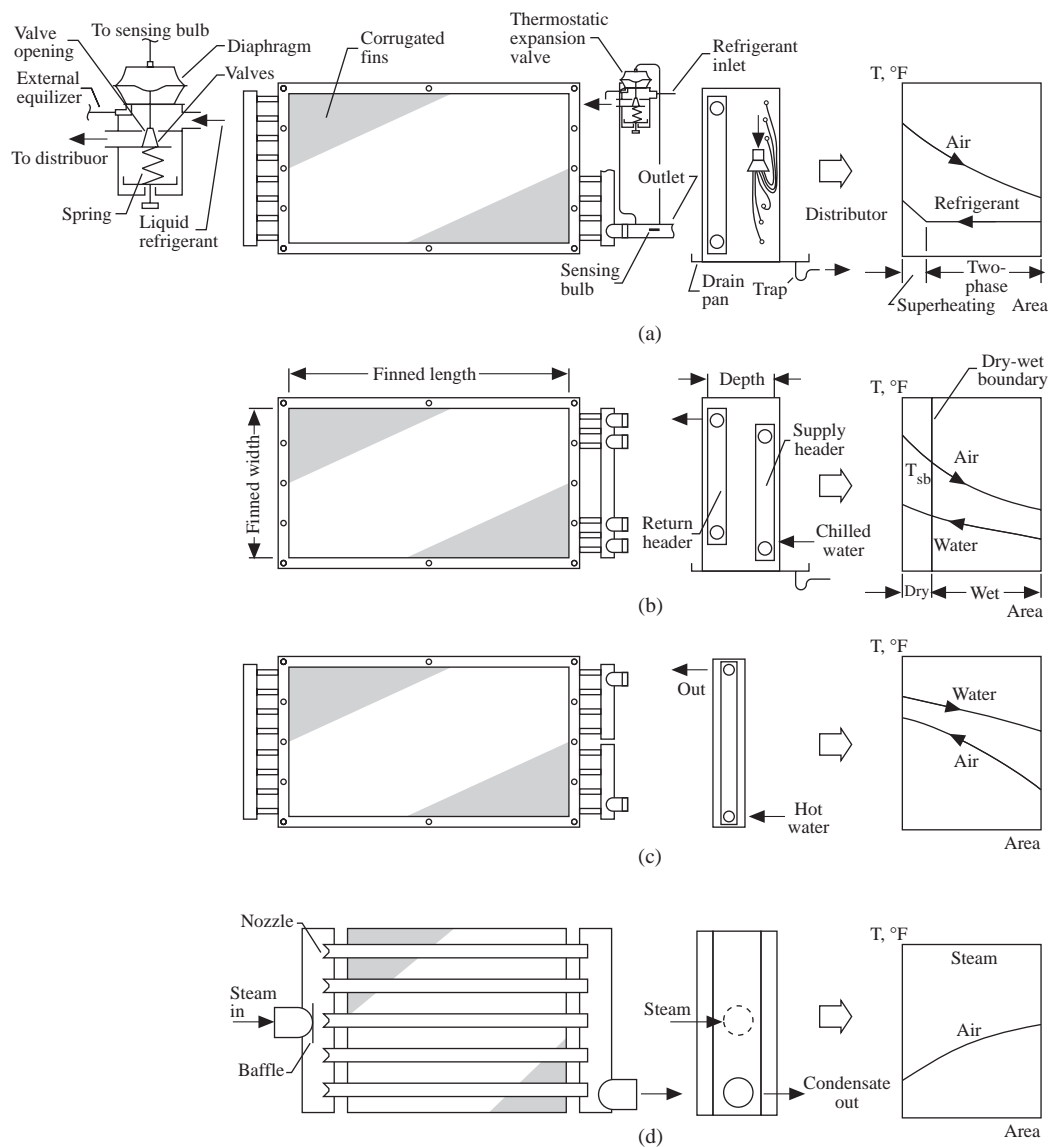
Types of coils: (a) direct expansion coil, (b) water cooling coil, (c) water heating coil, and (d) steam heating coil.
